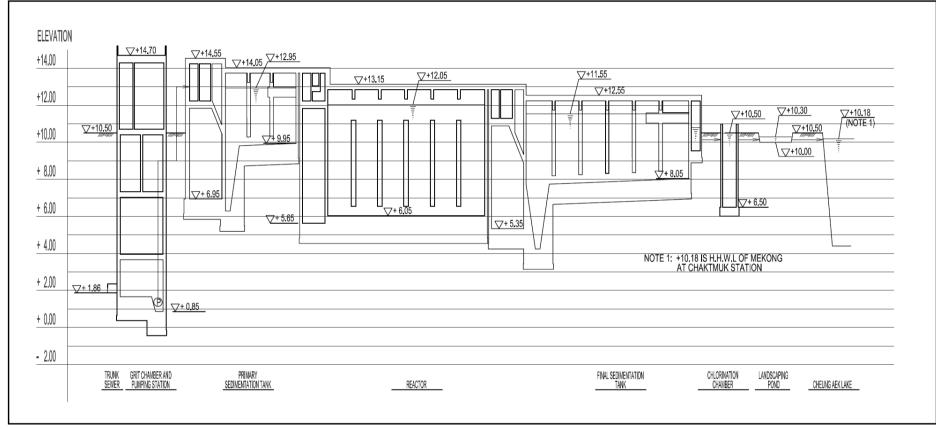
General Layout of STP constructed in Preparatory Project
